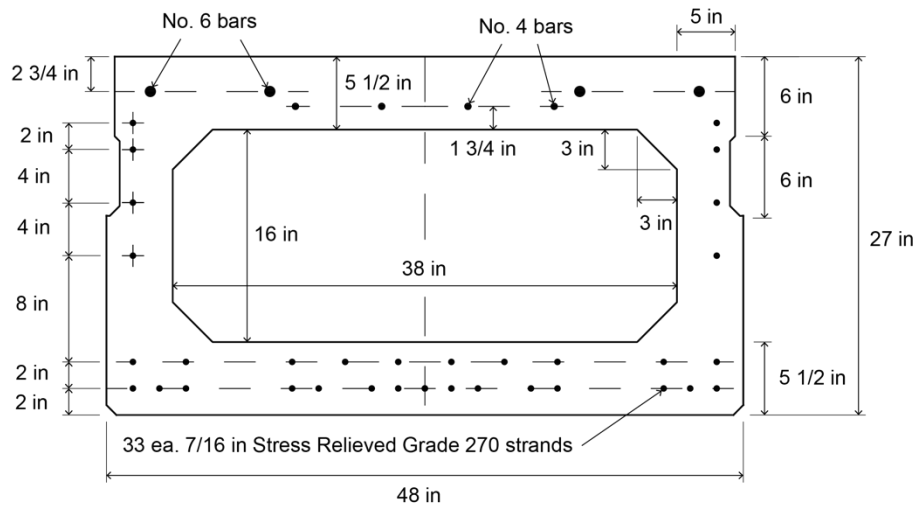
Cross-Section of Aden Road Bridge Box Beam-3 from Alfailakawi (2019)
